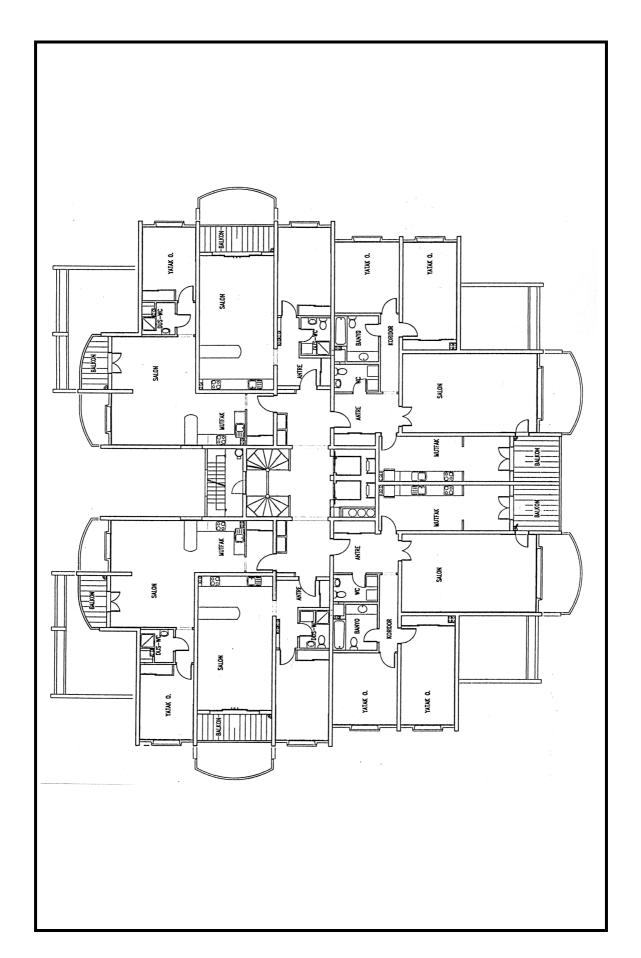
Mavişehir II; Albatros 17th – 19th Floor Plan
